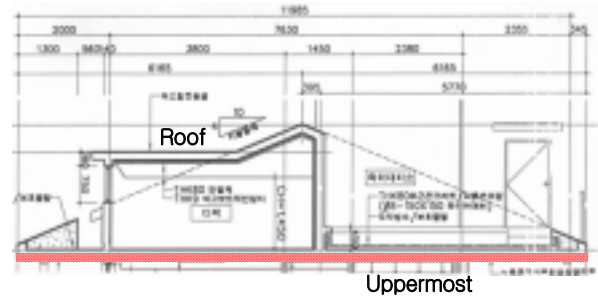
Details of the top ceiling, bottom floor, roof and underground walls
